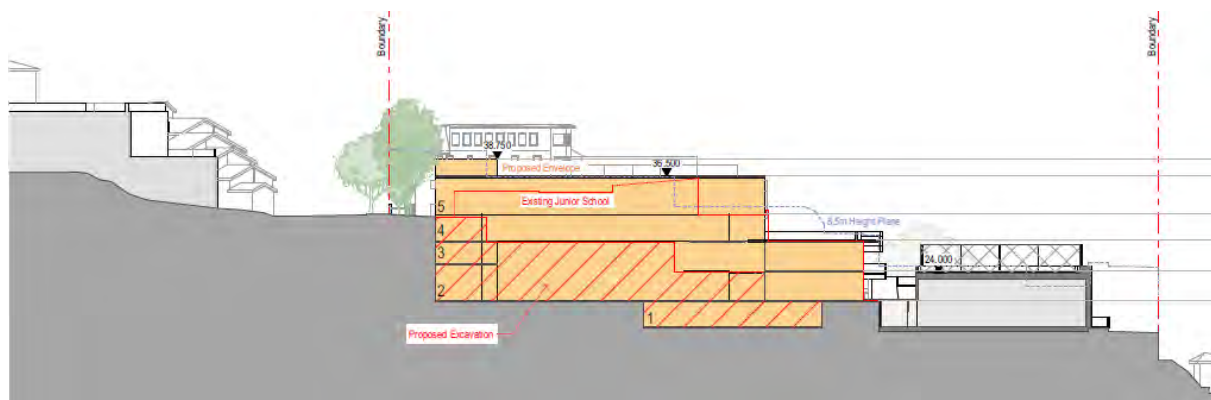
Section through the proposed new auditorium building, which will replace the Junior School. The red line outlines the existing Junior School Building. Although the new building is taller than the existing building at its Carabella Street frontage, its overall height as it steps down the site approximates that of the existing building. (Source: fjmt, 'Southern Precinct Section', excerpt from MP-4004)
